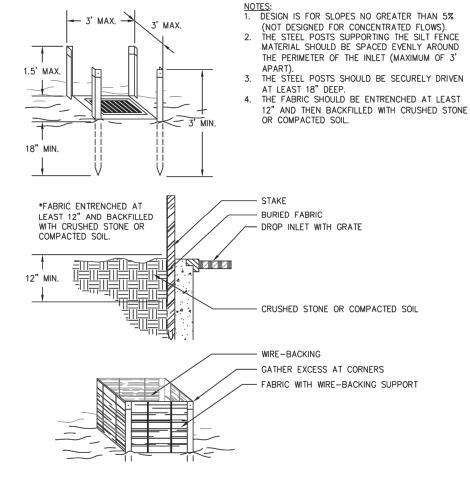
Filter Fabric with Supporting Frame Installation Requirements (Sd2-F)
